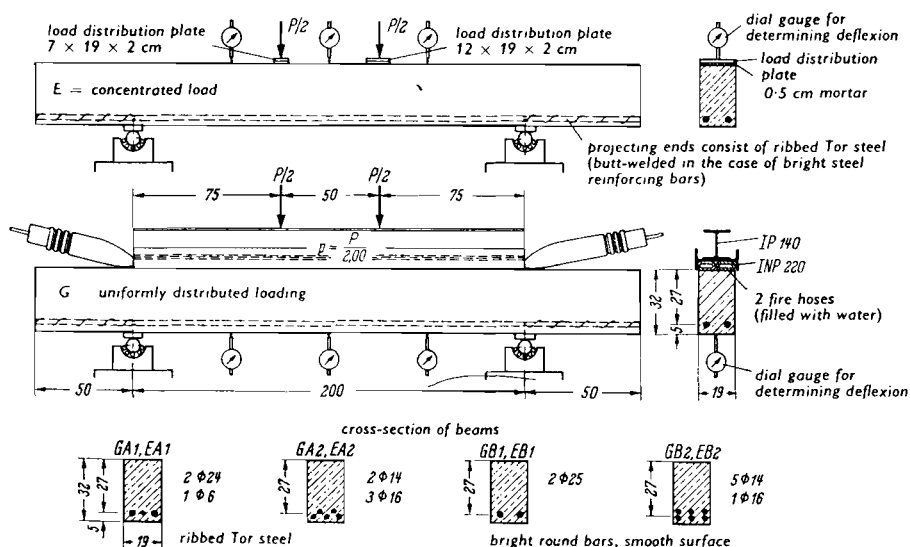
Test arrangement and dimensions of beams with varying bond of longitudinal reinforcement.
